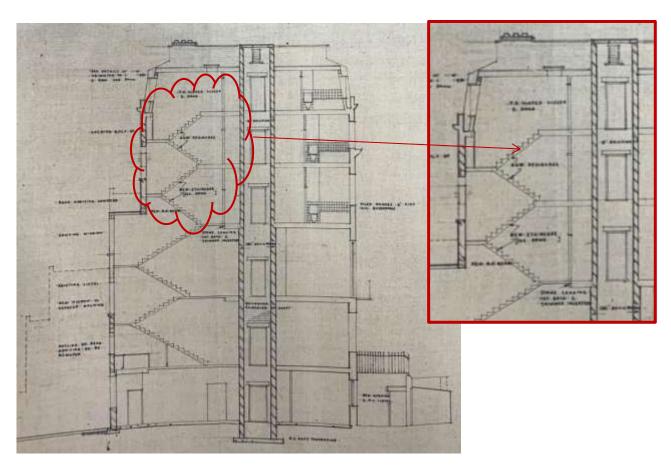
Section A-A – showing new stairs being installed to the upper floors of No 32 $\,$
